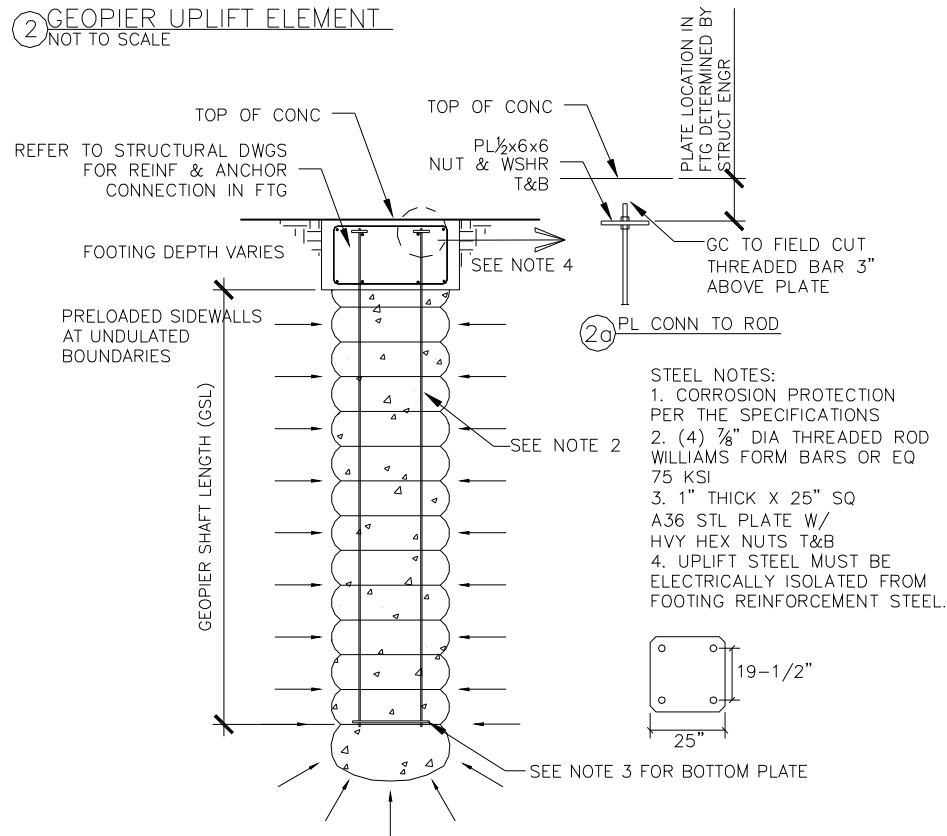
Typical Detail of a 4-bar RAP Uplift Element
